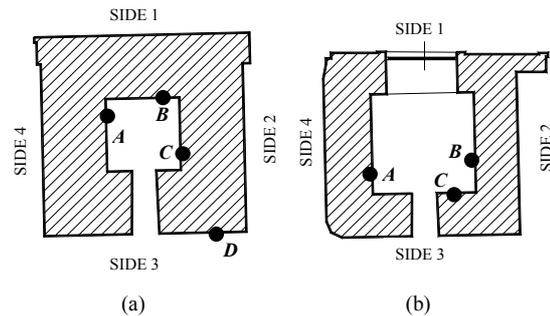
Plan scheme of the single and double flat-jack test sites. Test sites at the foundation floor (a), and at the ground floor (b).
